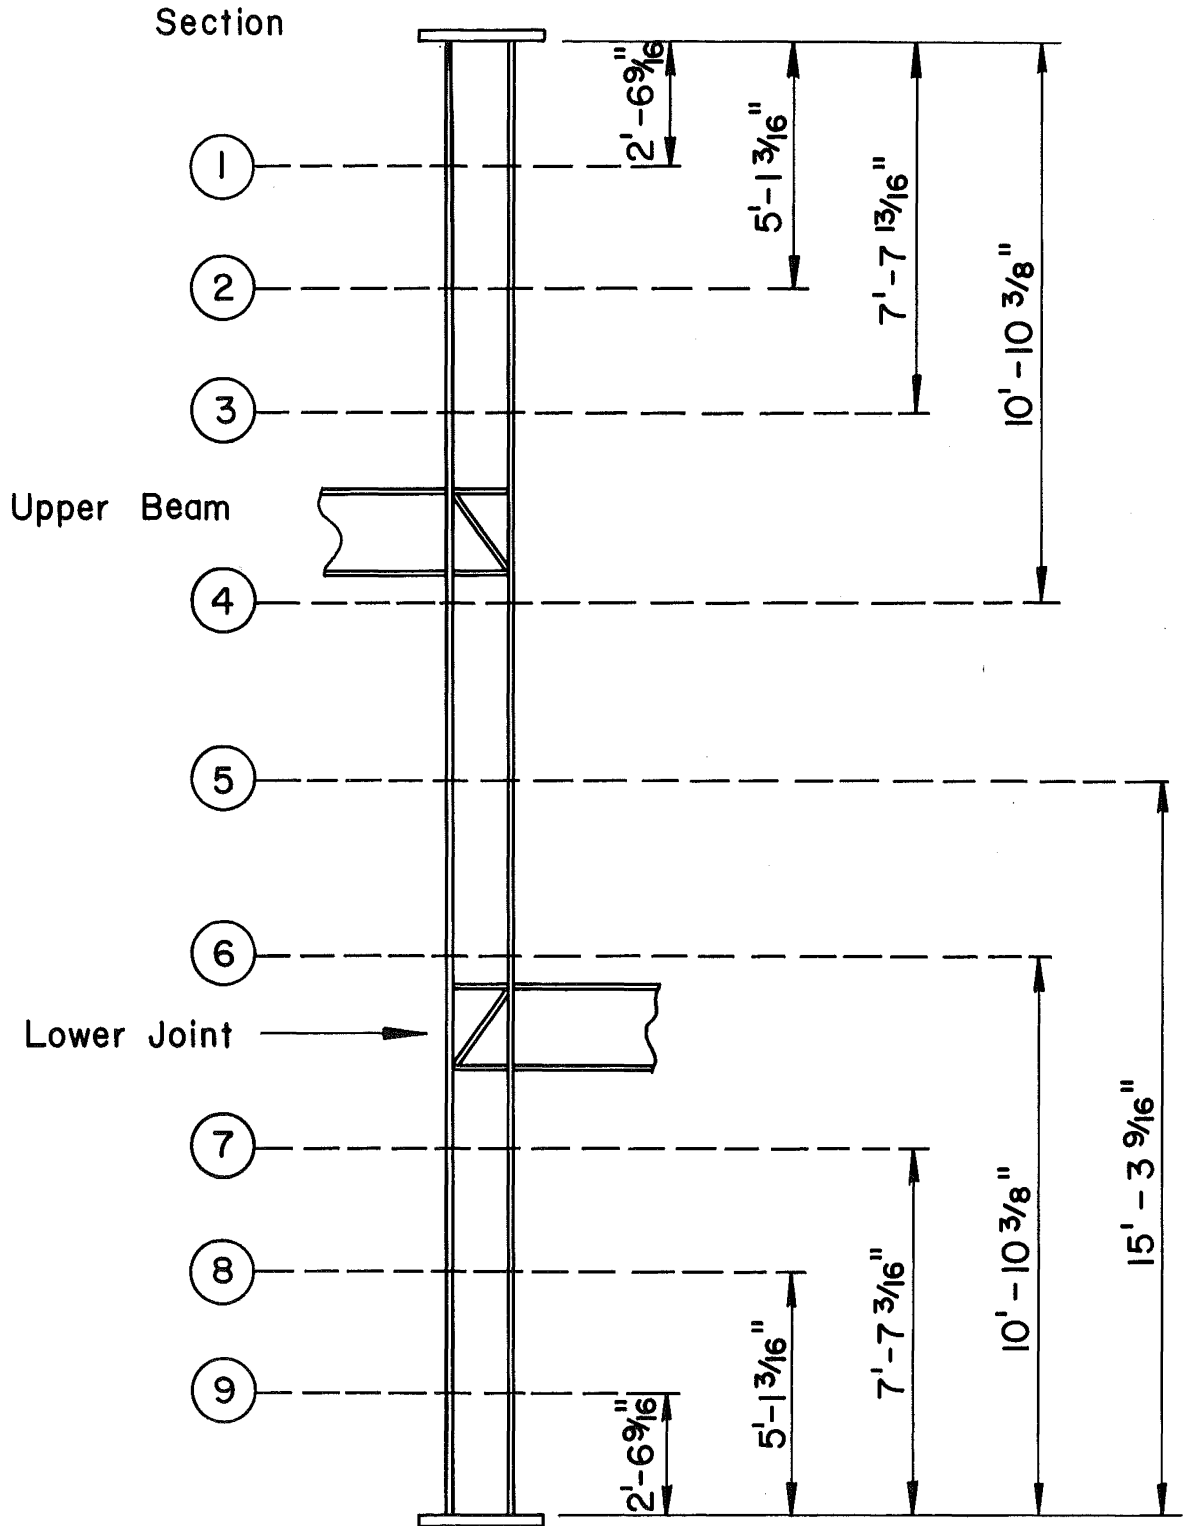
Location of Sections at which Strains Due to Twisting were Recorded
